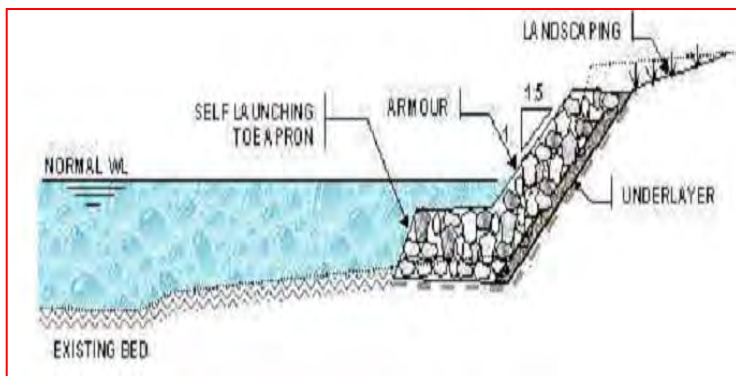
Stone rip raping (Adapted from Tweed River Estuary Management Plan 2009)
